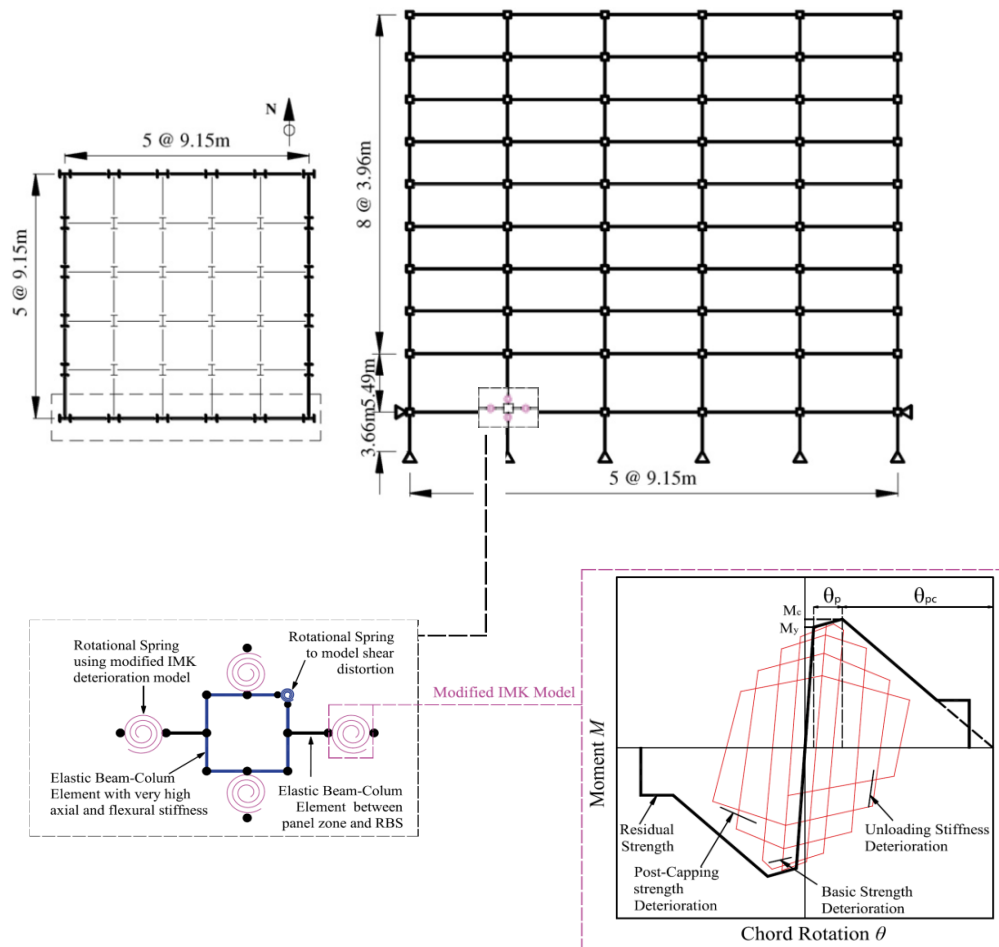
Nine-story steel special moment resisting frame: (a) Plan (b) elevation of nine-story steel special moment resisting frame (c) modeling details.
